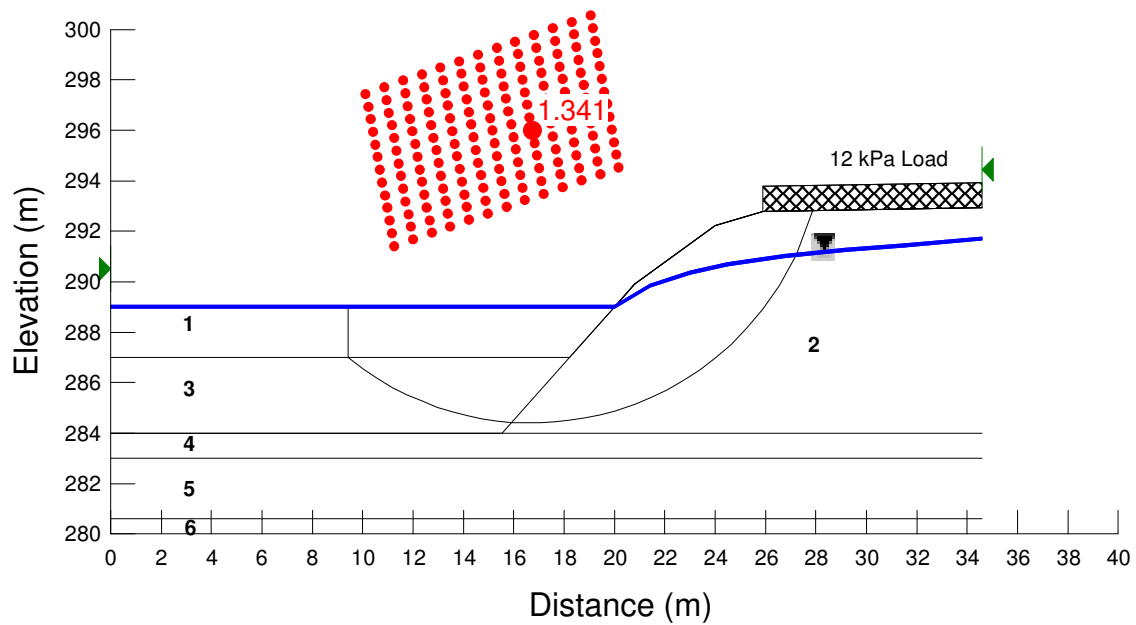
Stability of HWY11 Road Section at Sta. 14+850
